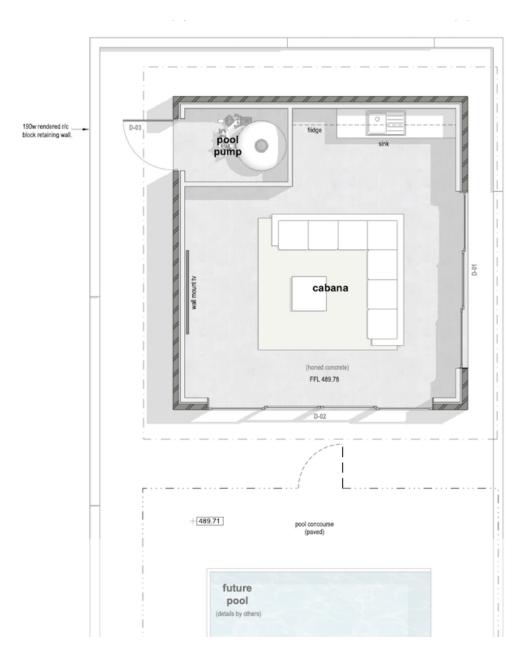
Source: Gavin Dale Design. Proposed Cabana + future pool Plan - June 2022.
